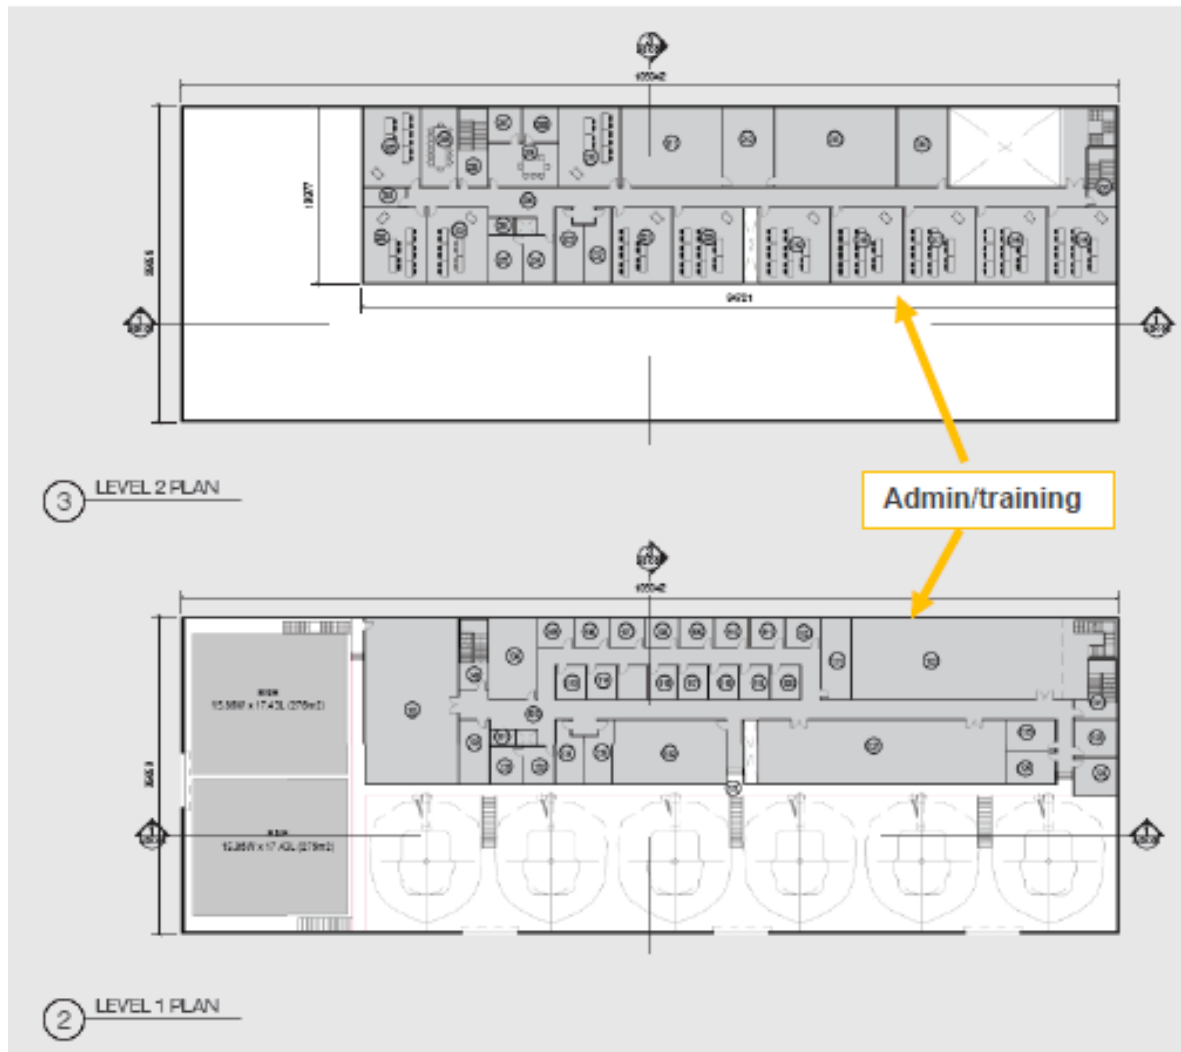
| Conceptual Site Layout (Level 1 & 2)
